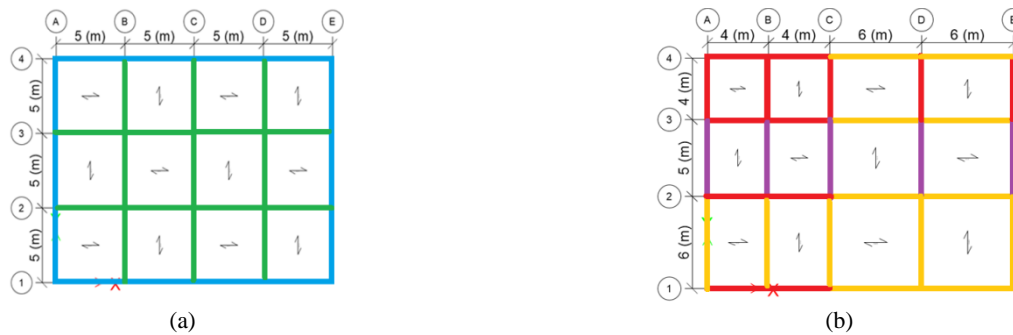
The plan of different types of modeled structures: (a) Structure with regular plan; (b) Structure with an Irregular plan
